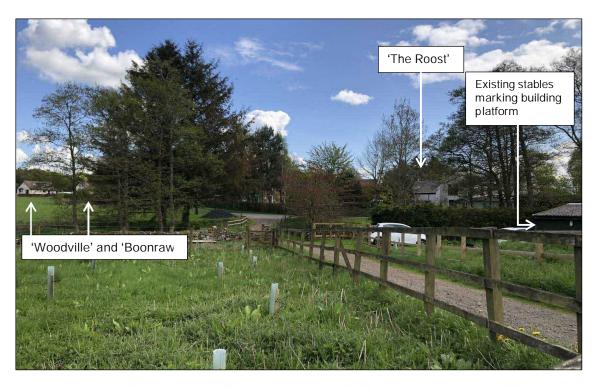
View of subject site from north-west looking towards building group at Whiteburn with 'The Roost', 'Woodville' and 'Boonraw' visible in background. Source: Ferguson Planning Site Visit.
